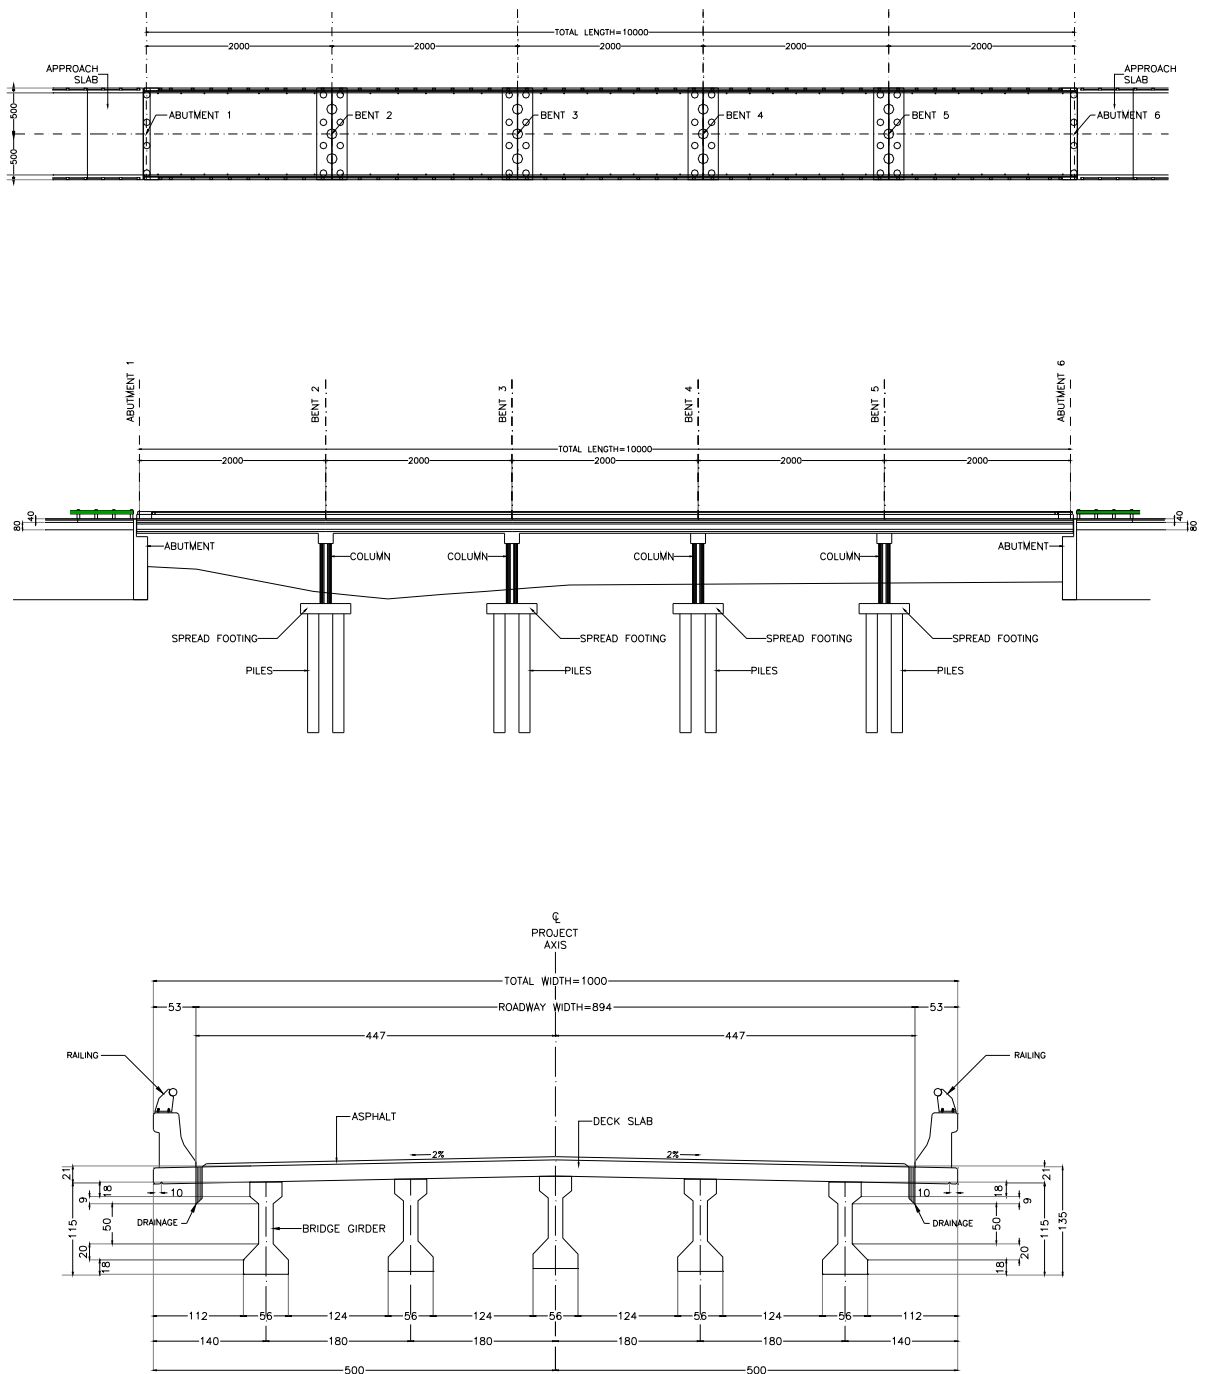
Plan view, elevation view and transverse section of the 5 span bridge model
